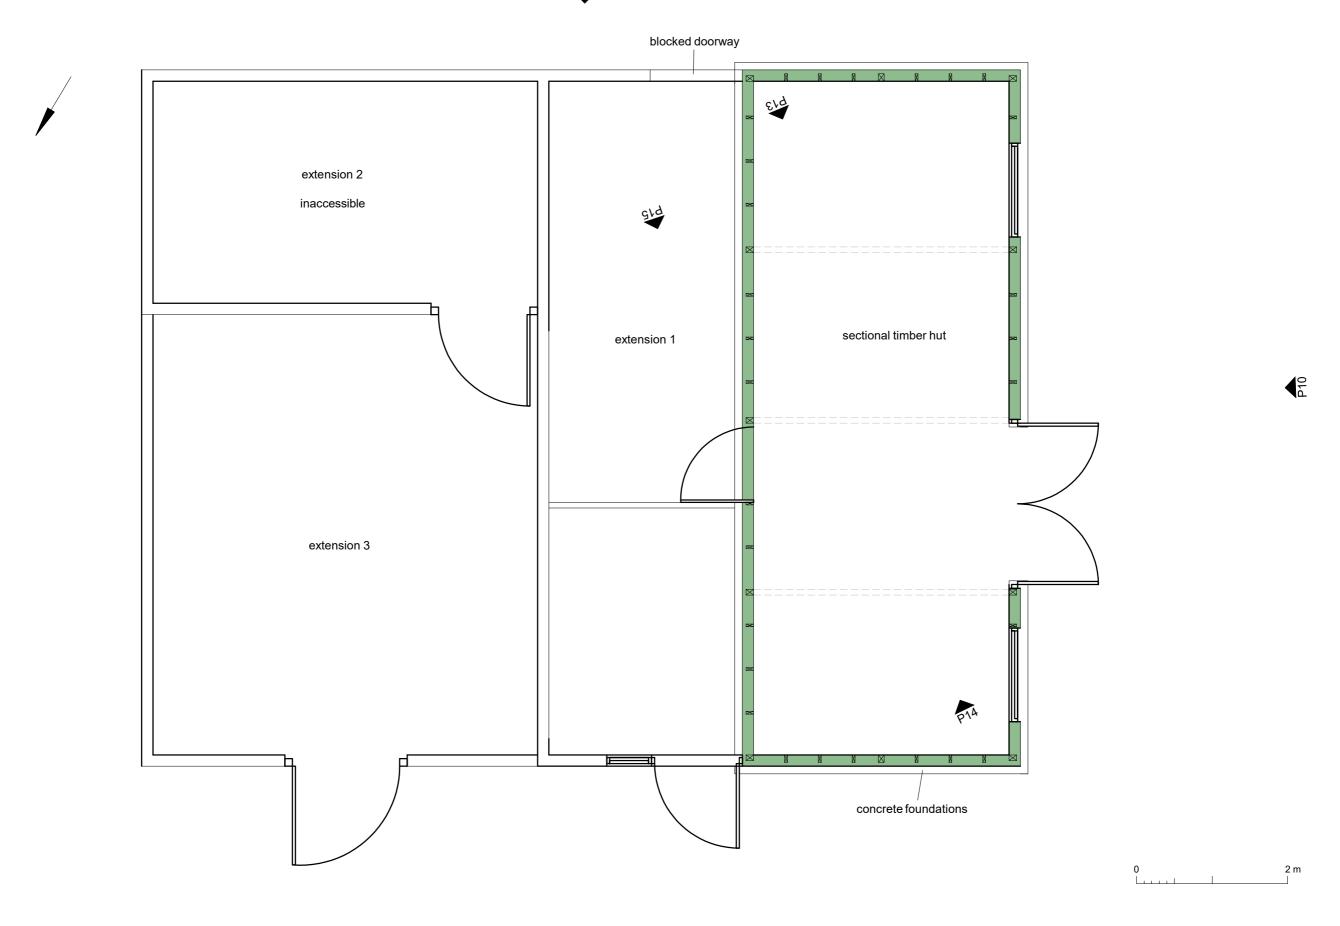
Sectional timber hut floor plan. The original footprint of the hut highlighted in green. Location and direction of photographs reproduced in the text shown.
